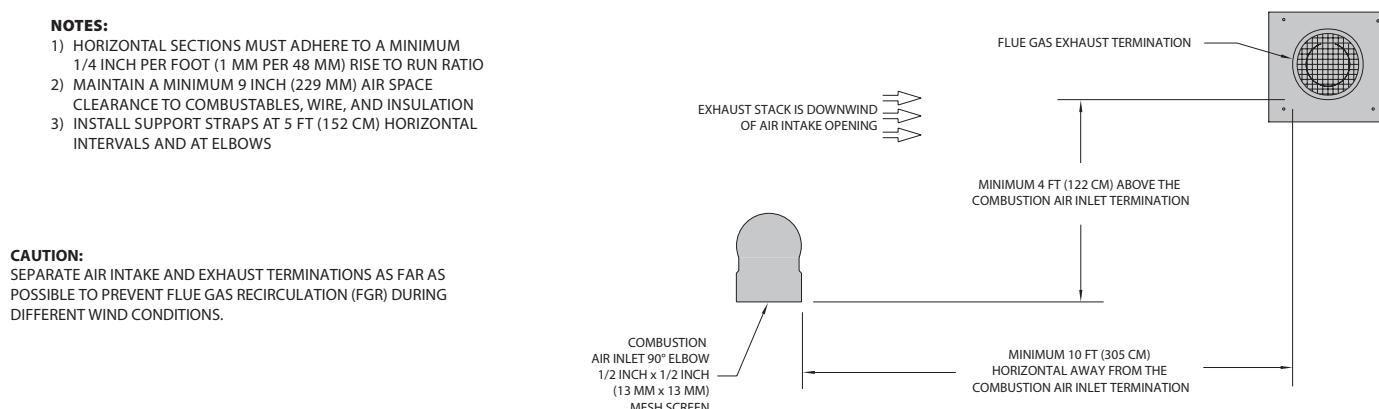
SIDEWALL PENETRATIONS DETAIL
